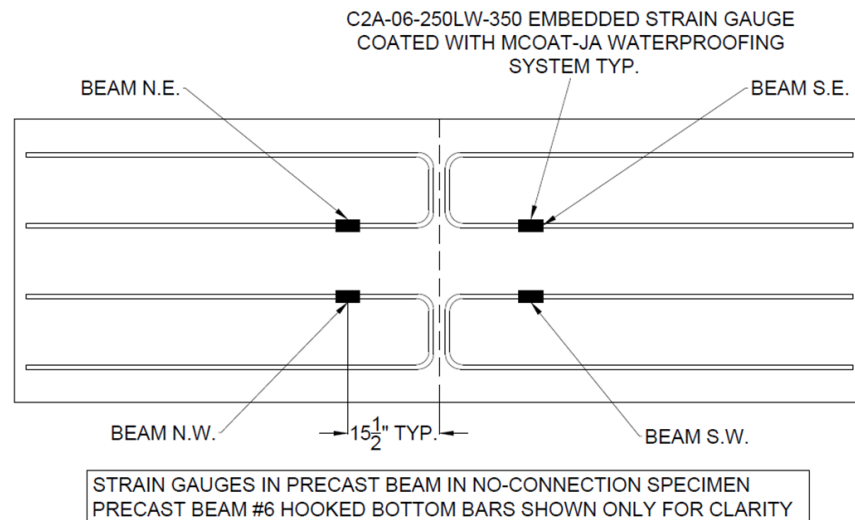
Plan Views of Precast Beam Portion of Sub-assembly, with Embedded Strain Gauge Locations
